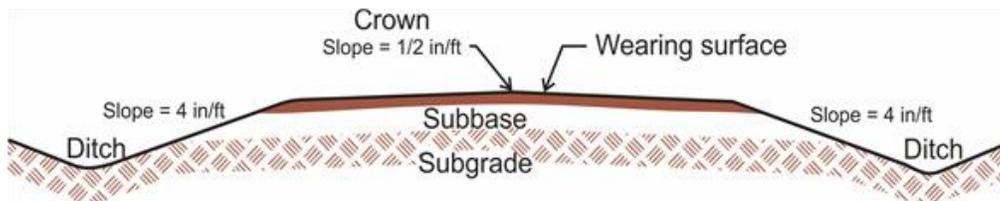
Illustration showing a cross section of a haul road.³⁰
